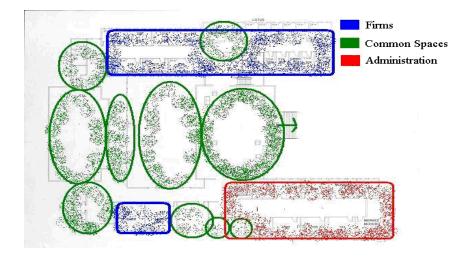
Plan of Incubator X (Main Building, Ground Floor)
